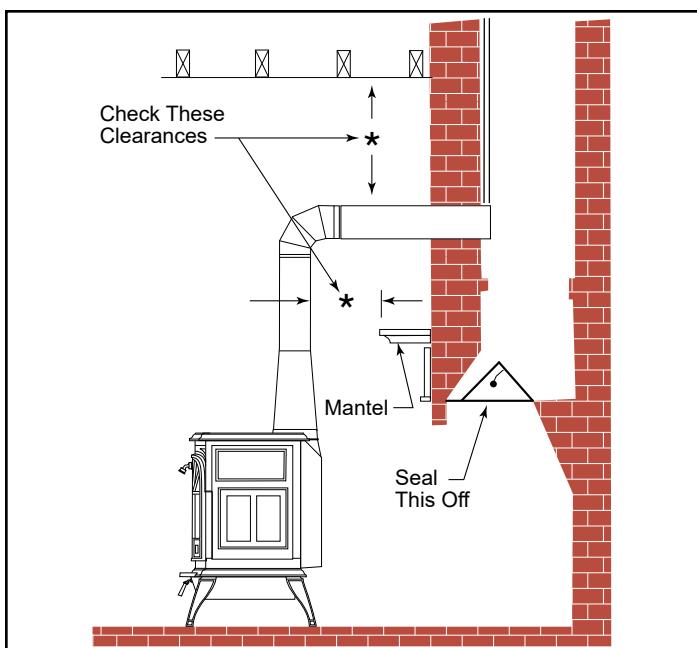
In this installation, the chimney connector attaches to the chimney above the fireplace opening.
